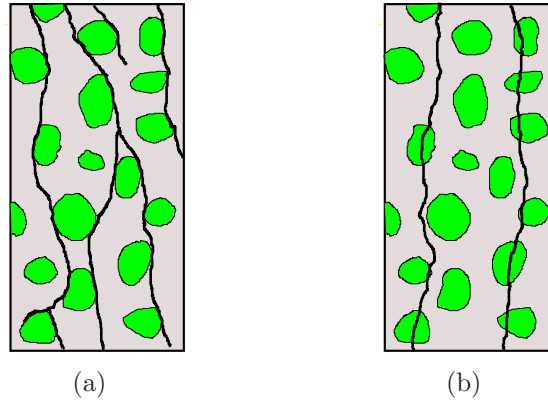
Sketches of failure patterns in concrete samples at unconfined compression test
